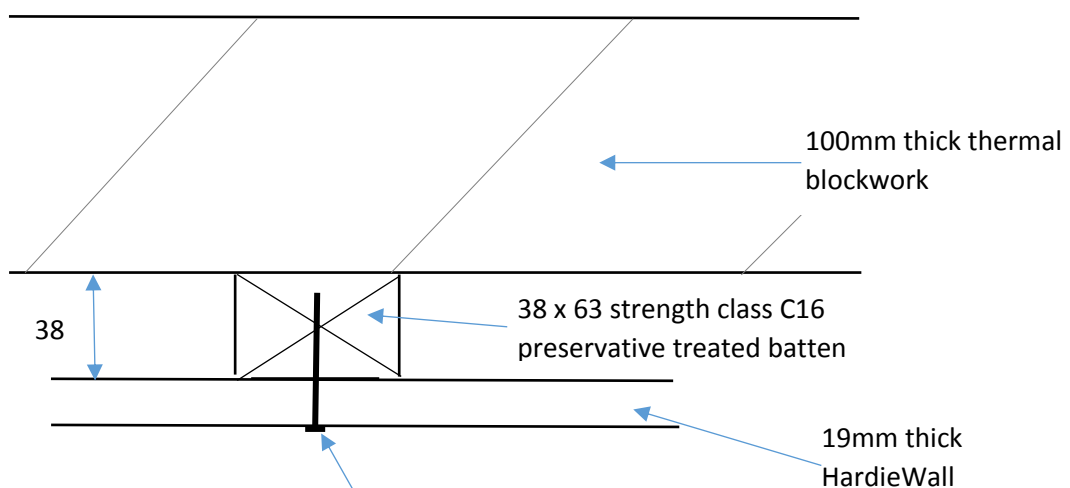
Cross-section showing fixing of 38 x 63 batten to blockwork
